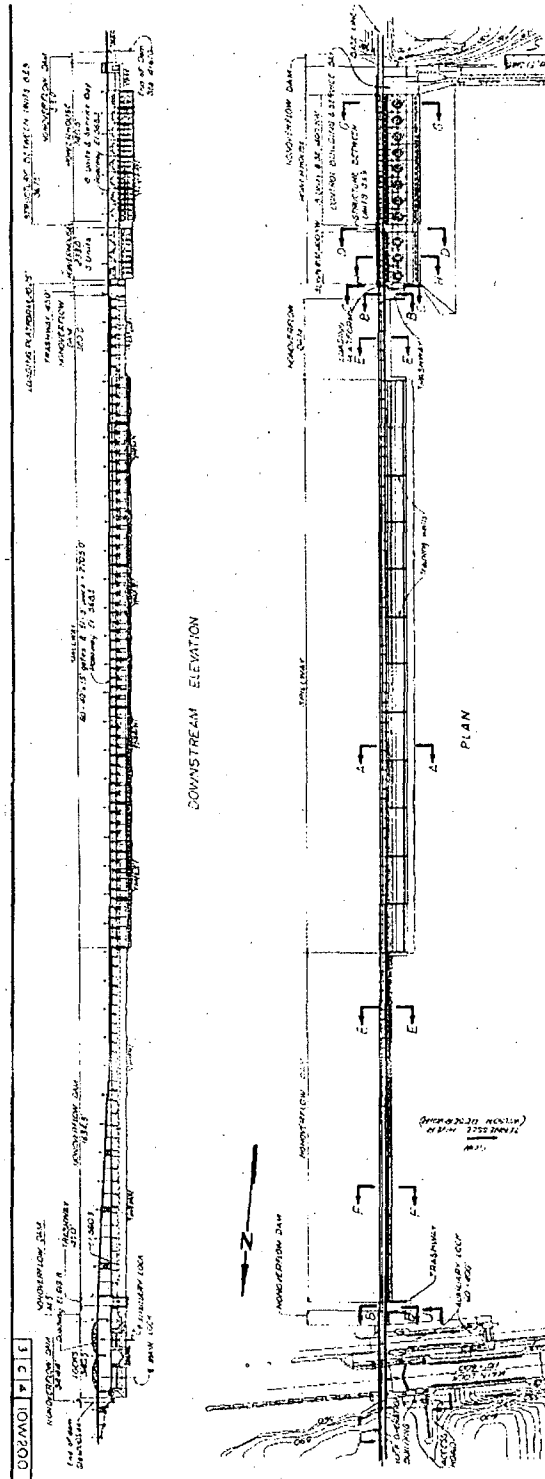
Wheeler Dam General Plan and Elevation (Reference 2.1)
